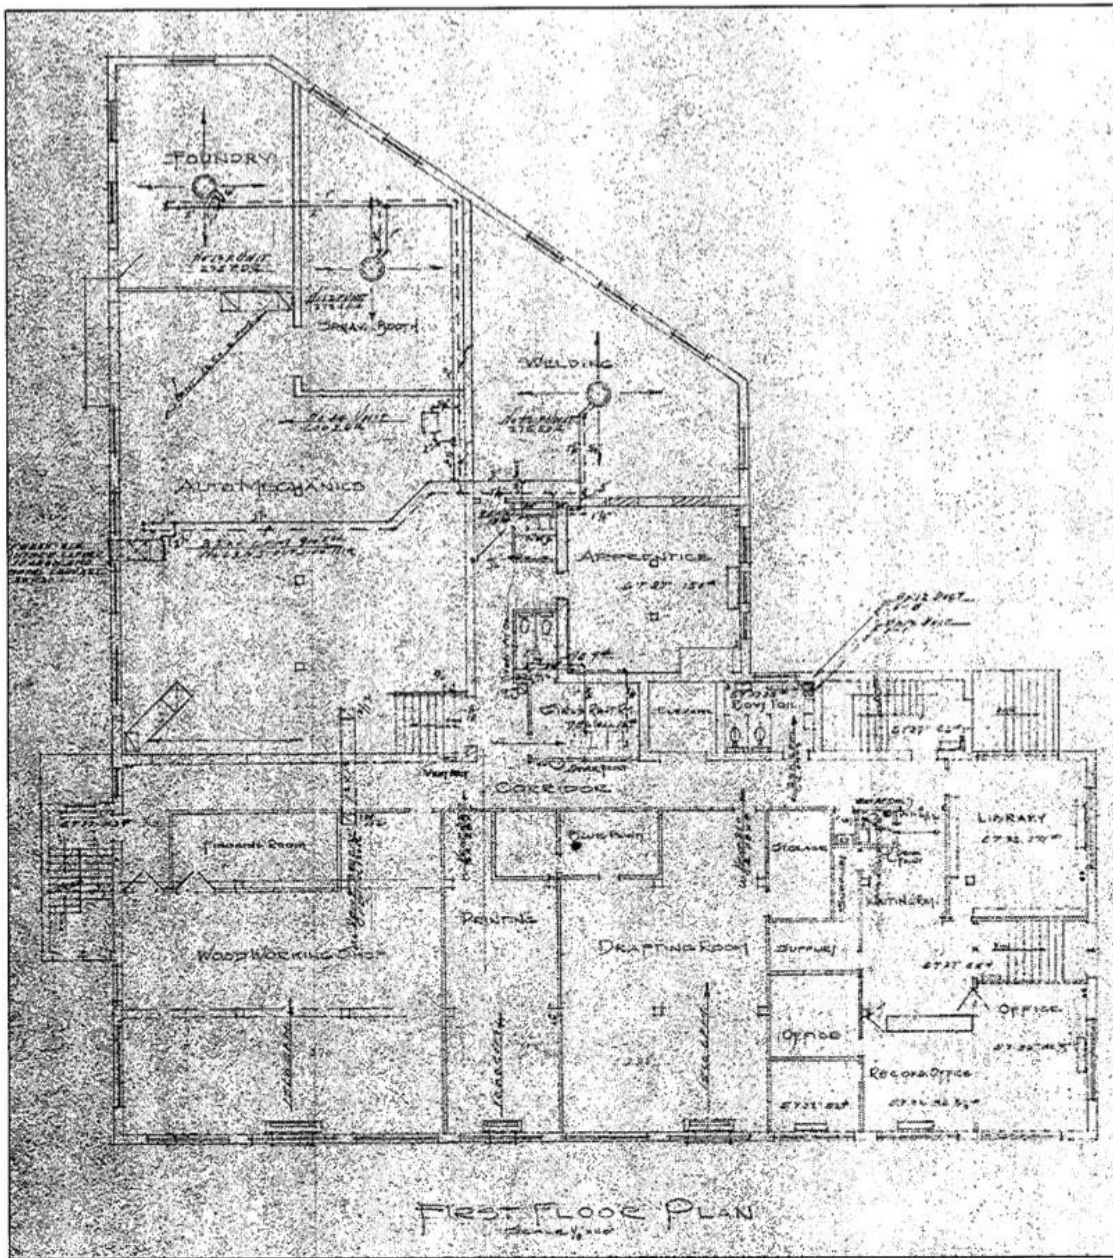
First Floor Plan – NYA Construction Drawings, 1941.
